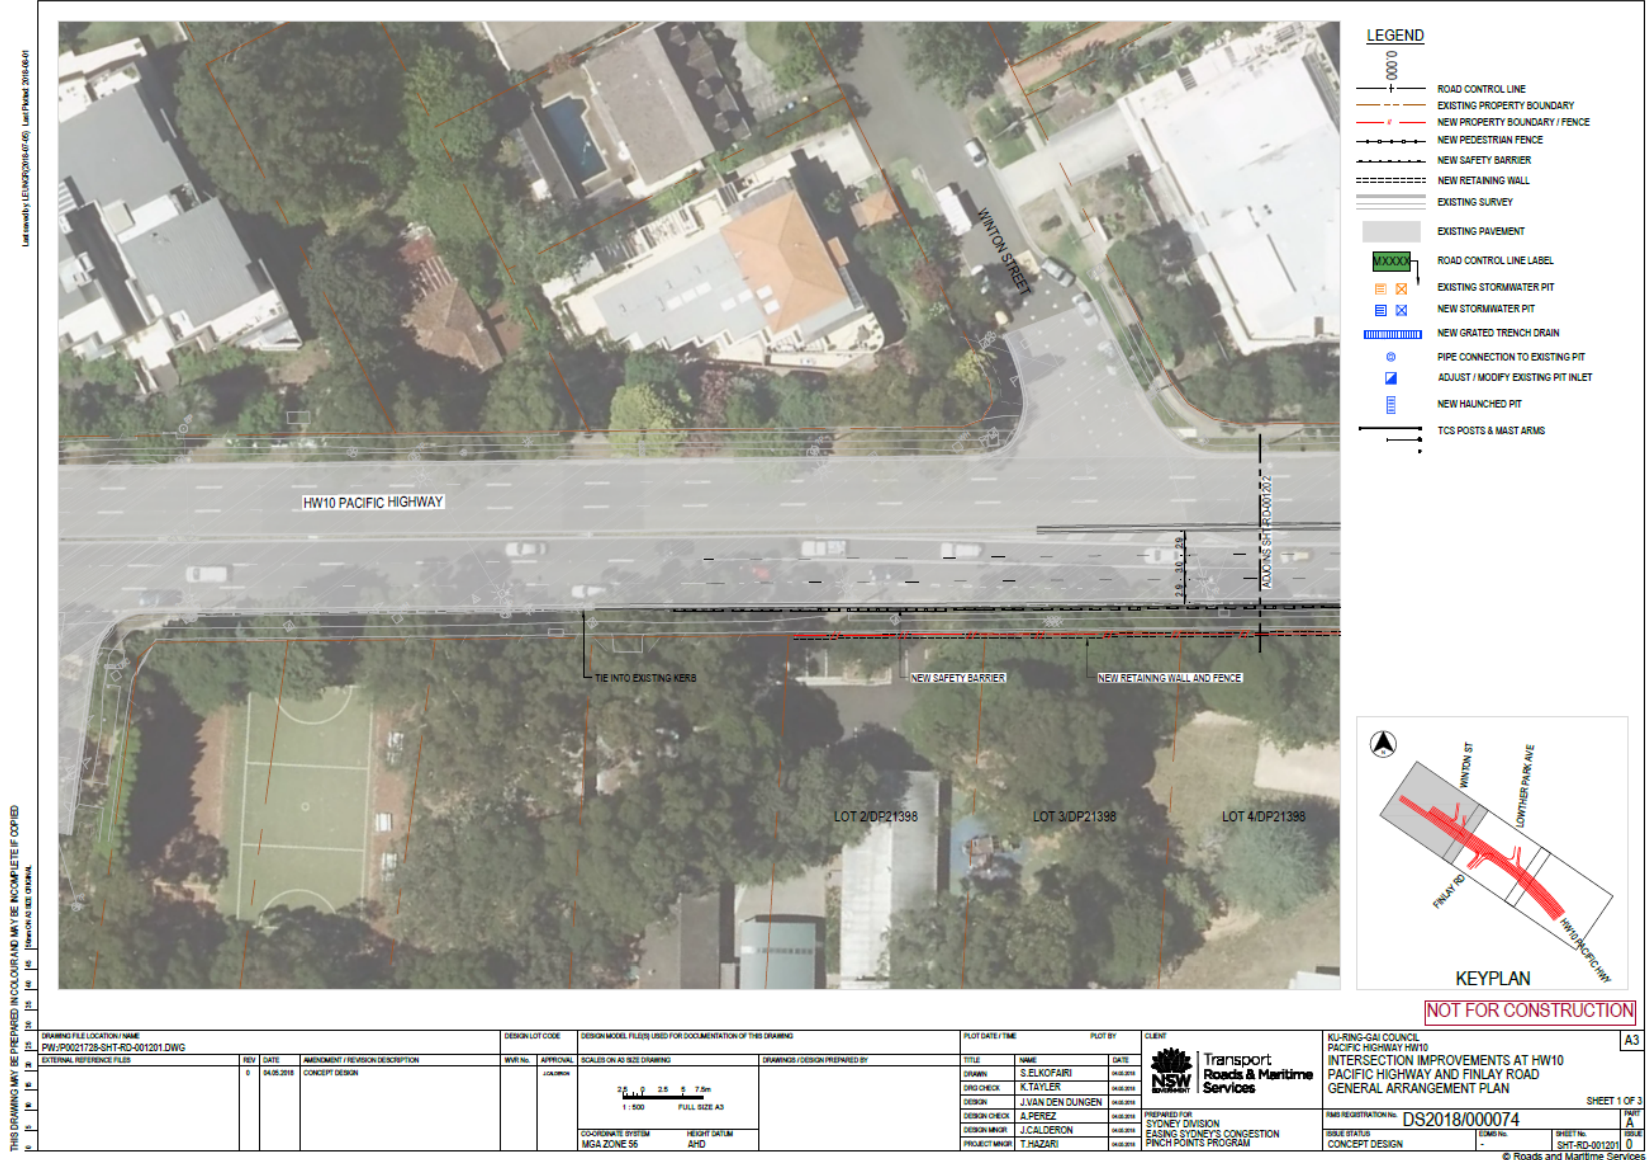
The proposal design – Intersection 1 (Pacific Highway at Finlay Road, Warrawee/Turrumurra) – Sheet 1 of 3
